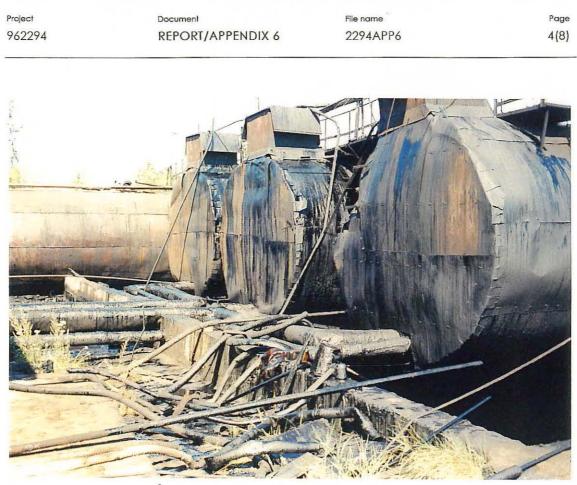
Four 100 m³ oil tanks in concrete basin (viewed from the south).
